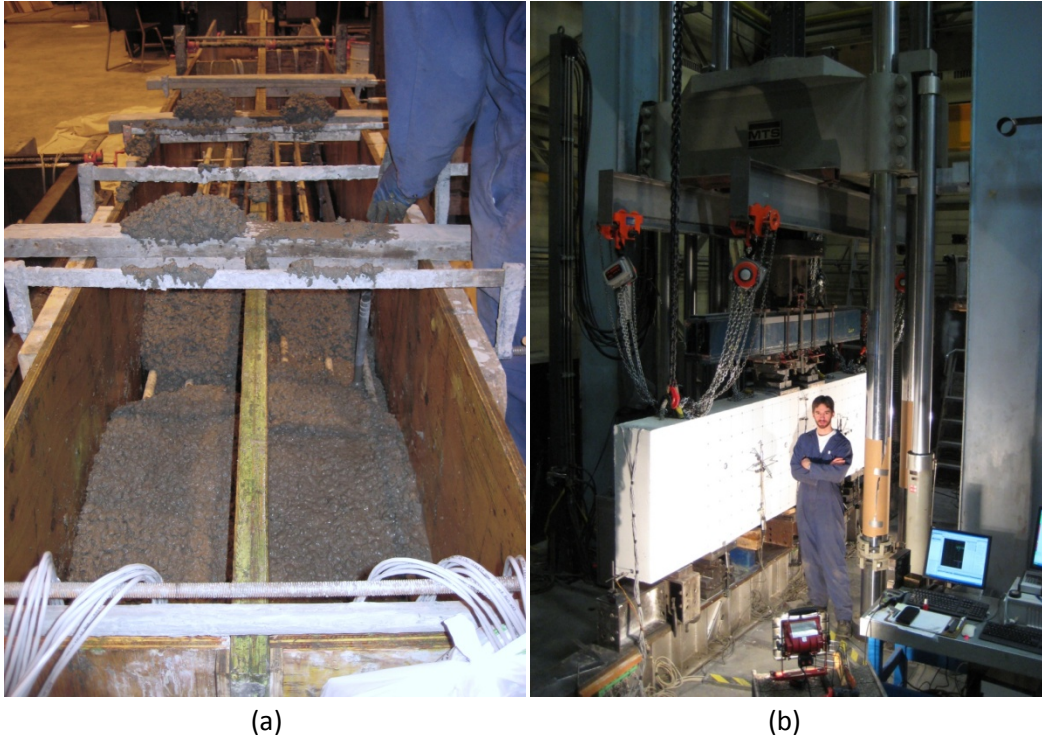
(a) vibrating concrete in the 600 mm deep formwork for specimen B5H and B6H and (b) typical test setup (specimen C1N shown).
